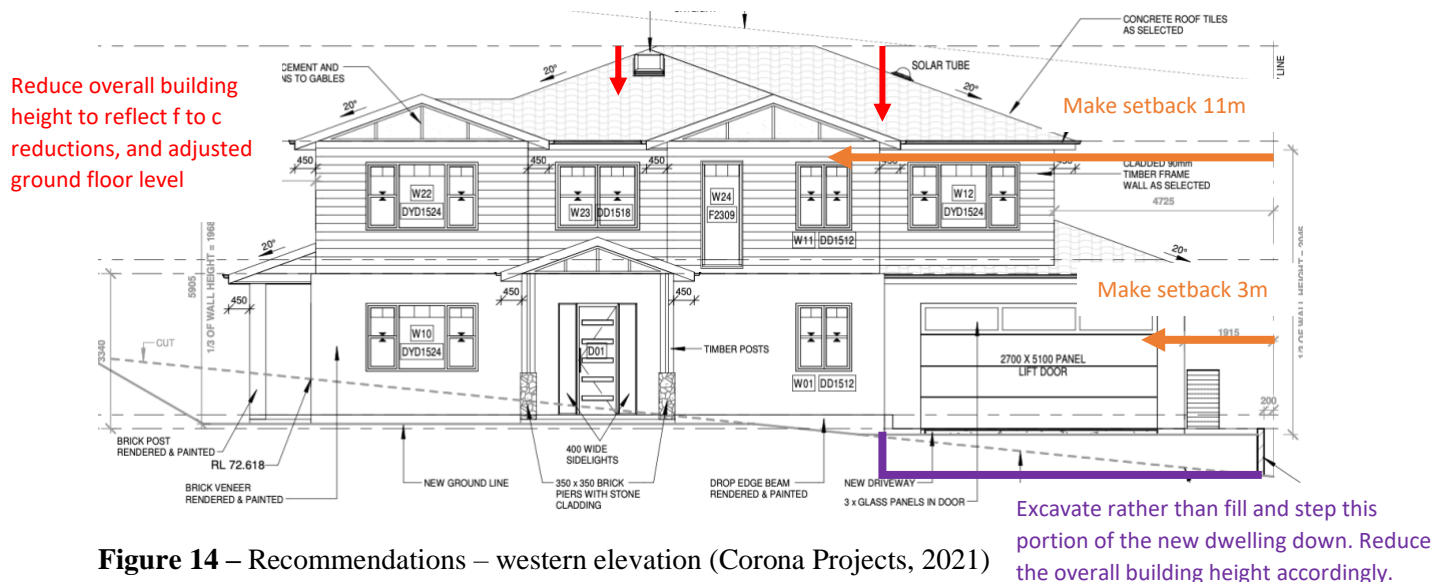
Recommendations – western elevation (Corona Projects, 2021)
